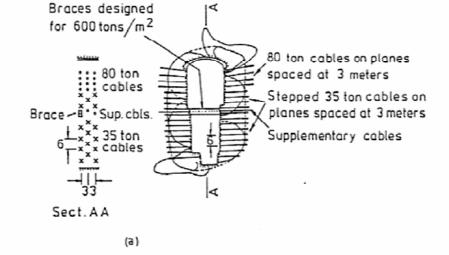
Wall stabilization scheme using prestressed ground anchors and Pali Radice piles (from Hanna, 1982)
